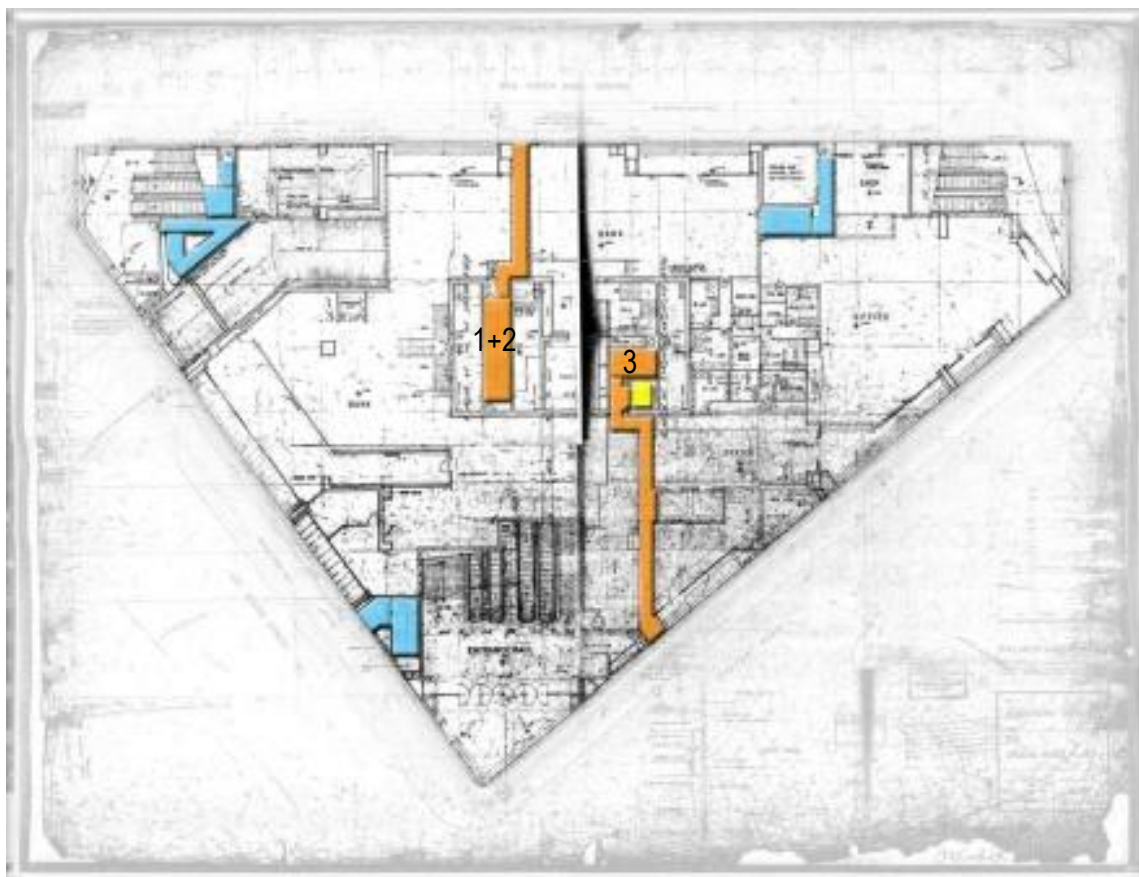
Ground floor exit routes (Palmer and Turner 1982)
